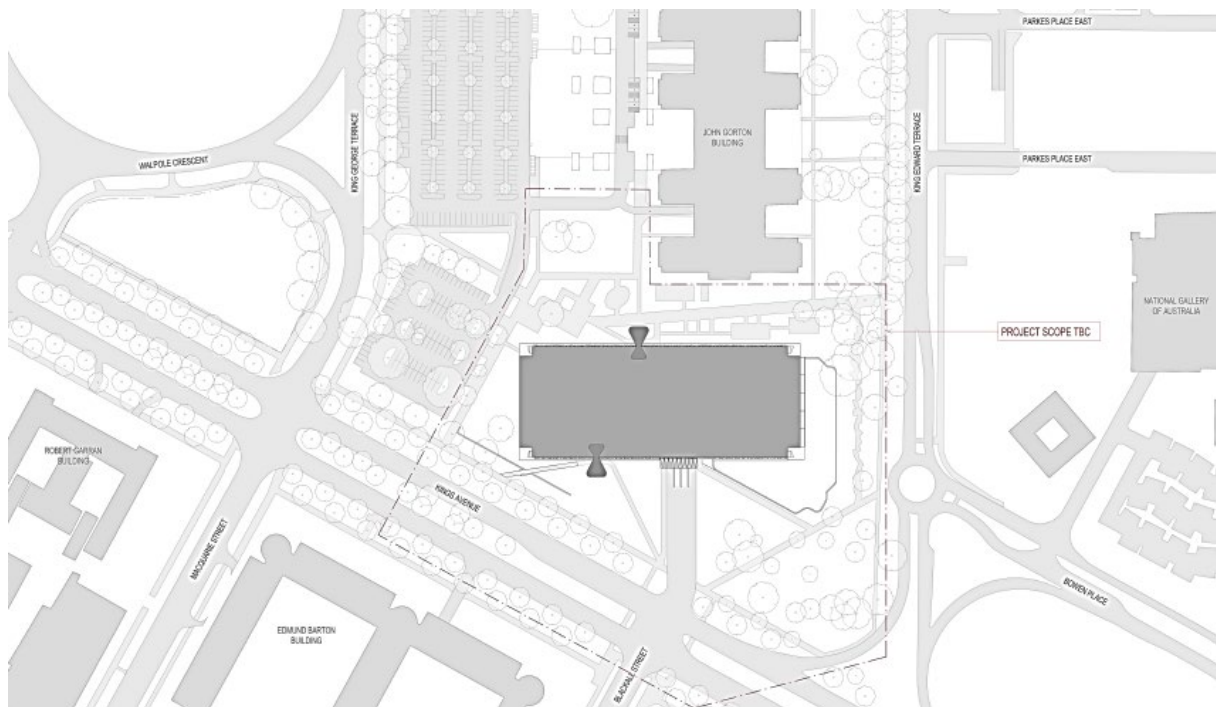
Proposed site of the carpark, located to the east of the John Gorton Building. This drawing also shows the proposed intersection at Kings Avenue and Blackall Street. (Source: BVN September 2022).
